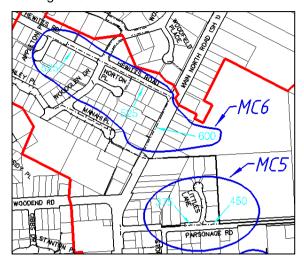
2001 Woodend Stormwater Management plan, Hewitts Road
